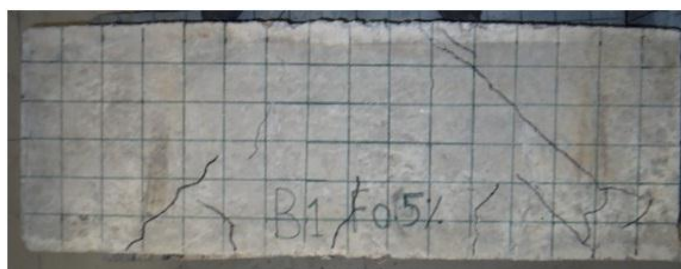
Crack Pattern of beam D30 AR80 [F0.5%]
